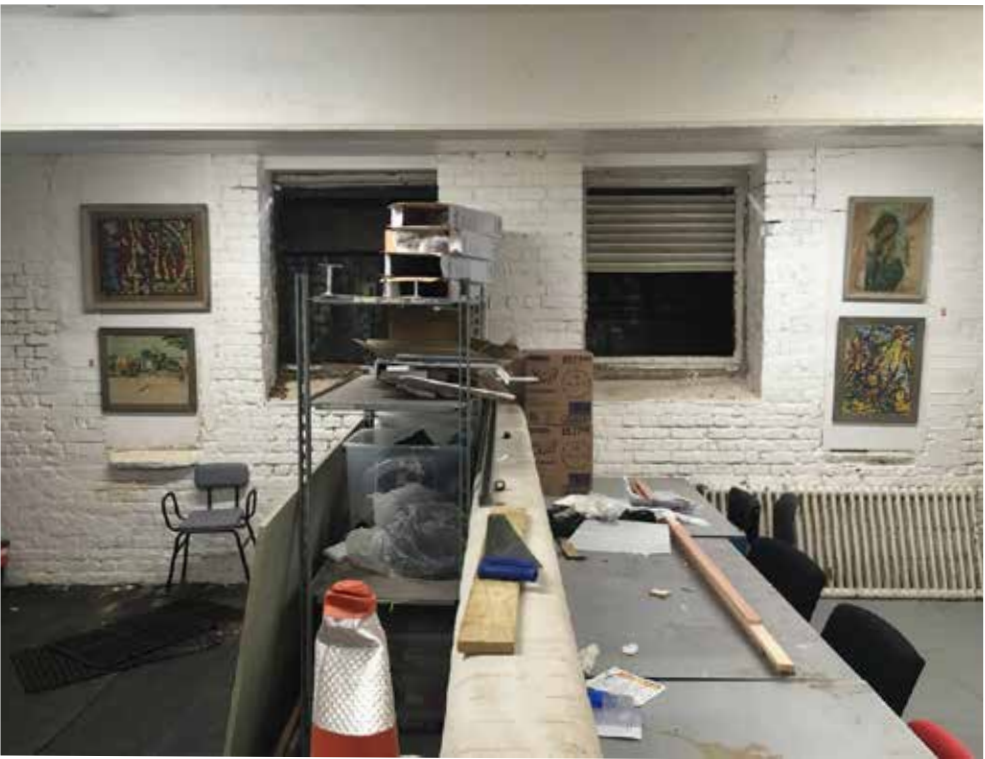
The low wall in the centre of the room and the sash and louvred windows.
